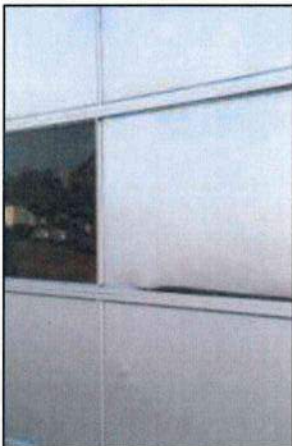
Fire Station #1 Garage doors display evidence of impact damage.
